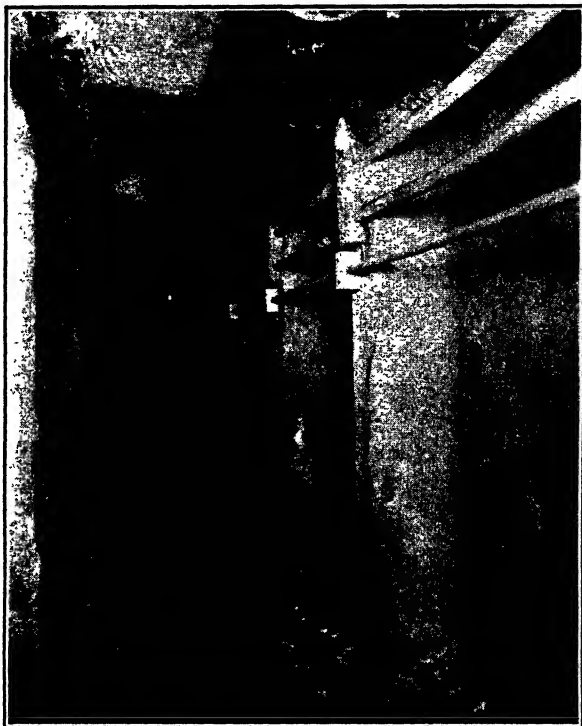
GUNITED DRIFT CONTAINING POWER CABLES.
